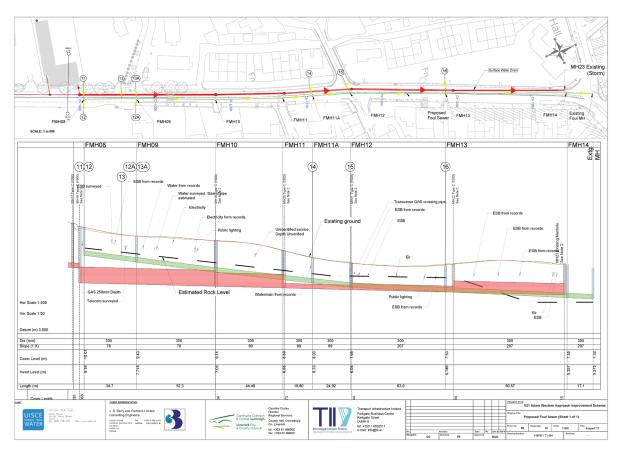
N21 Adare Western Approach Improvement Scheme - Proposed Foul Sewer drawing
